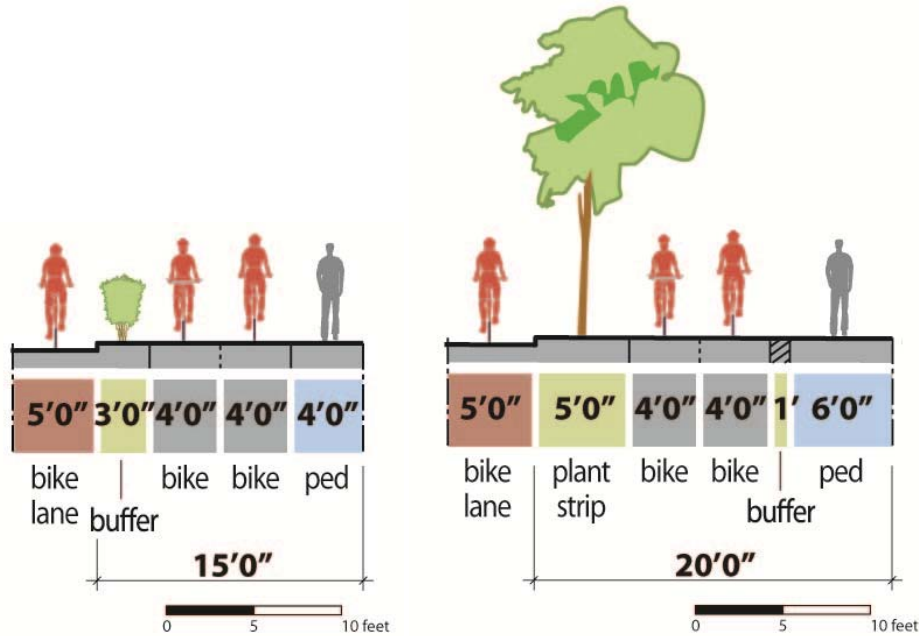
Standard Path Cross-Sections for Locations adjacent to Bridgeway with 15 feet of right-of-way (left) and 20 feet of right-of-way (right)
